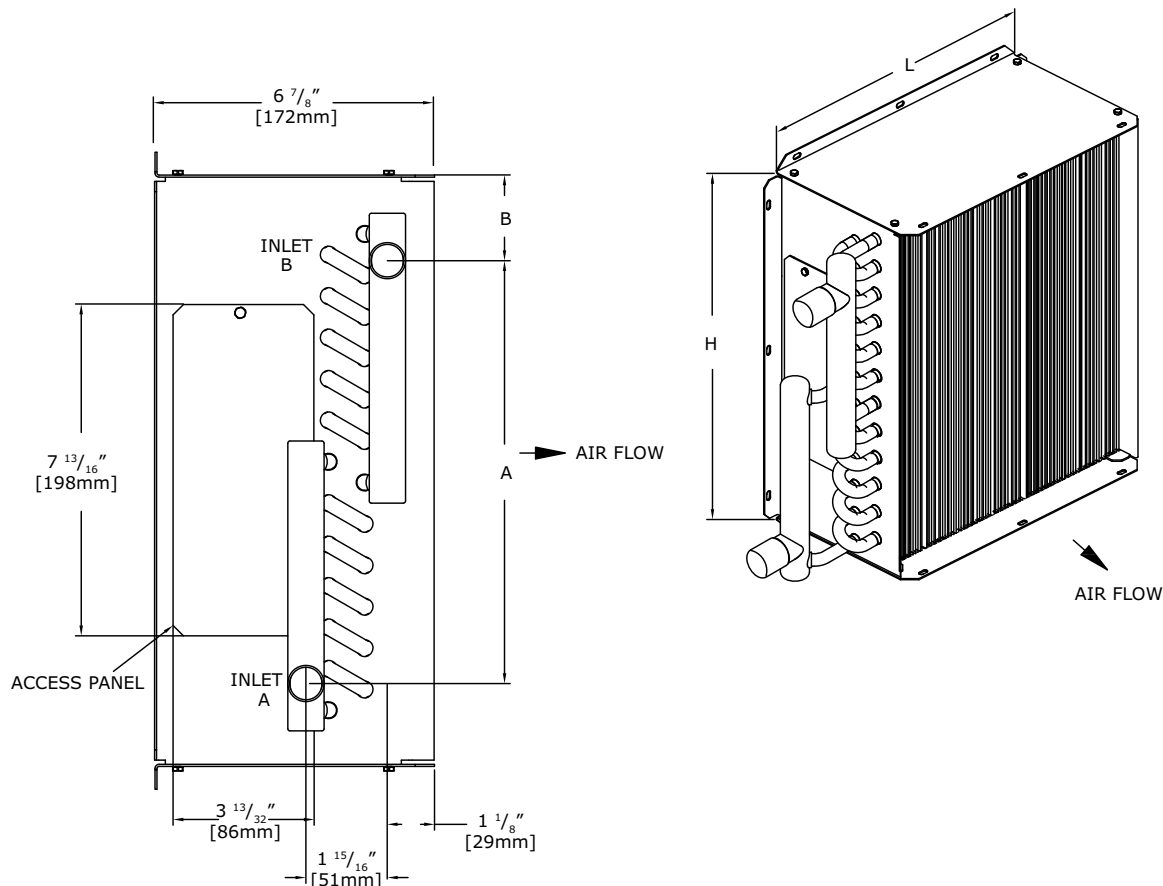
Low-height parallel discharge water coil assembly (1 row)
